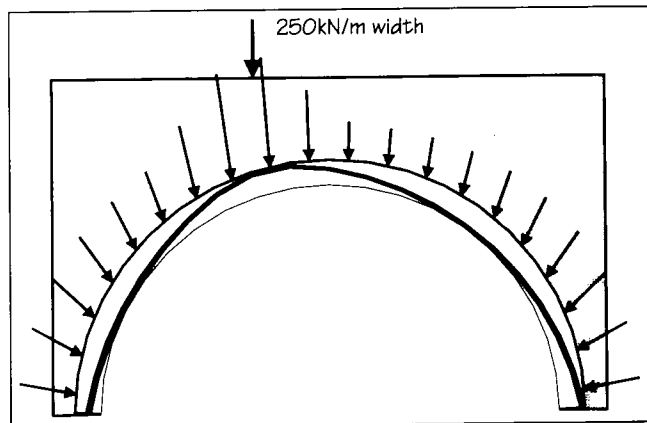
Fill exerting at-rest horizontal pressure for bridge at Bargower.
